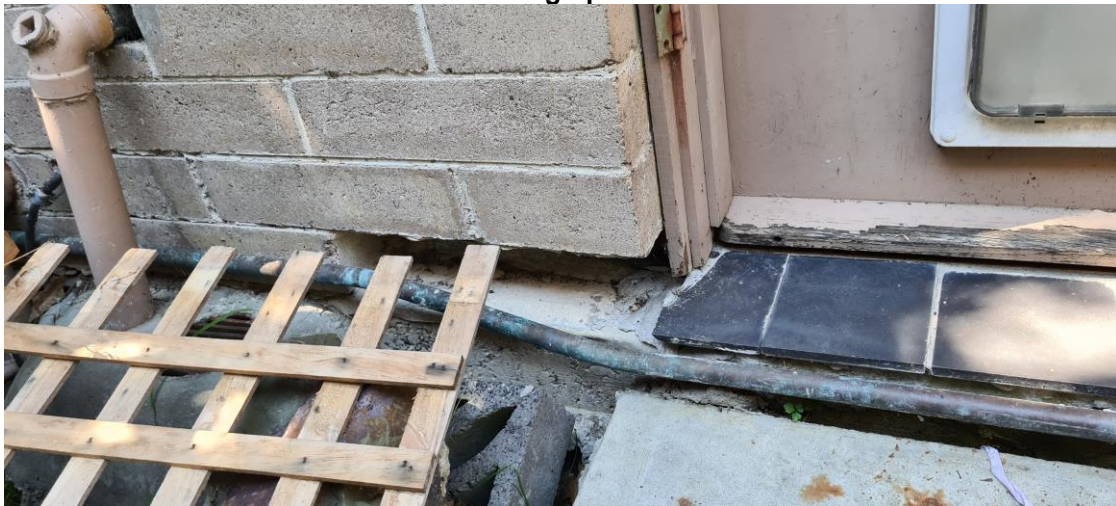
Stepped crack in brick wall between carport and storeroom
